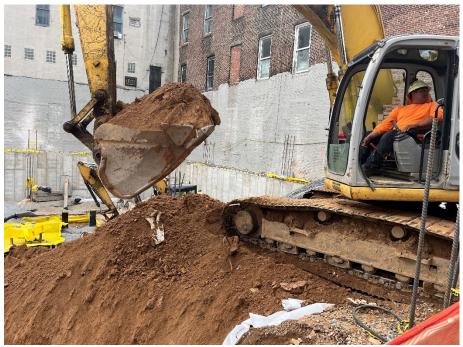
View of contractor preparing to load tri-axle trucks with non-hazardous material, facing southeast.
